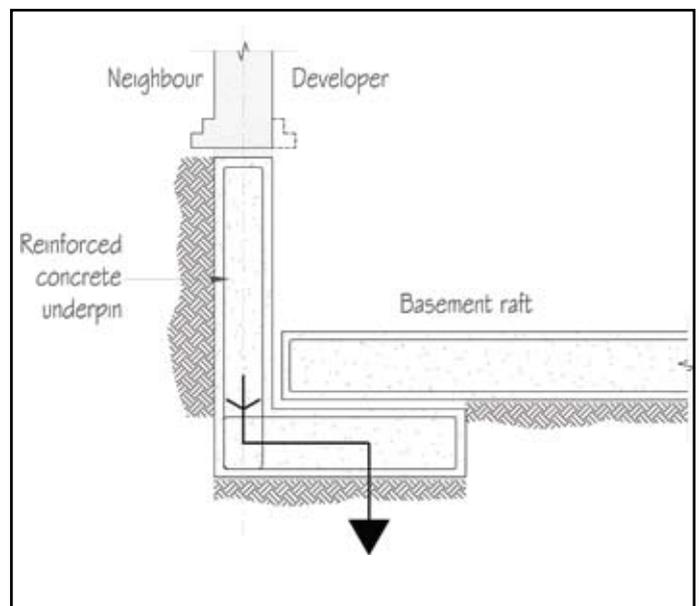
Reinforced underpinning (Special Foundation) but not integral with basement raft
